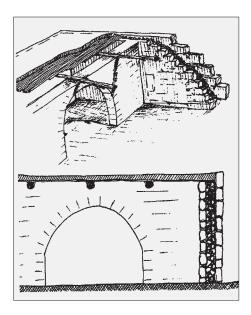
SECTION AND AXONOMETRIC PREVIEW OF BARREL VAULT ROOFING SYSTEM
